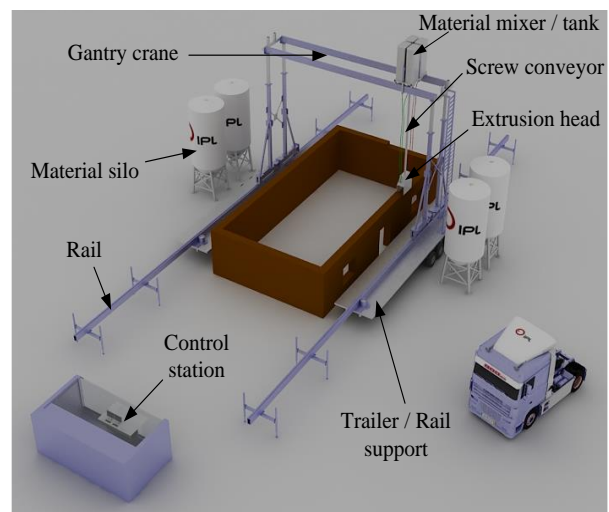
The proposed system for the automatic construction of a building (real scale).
